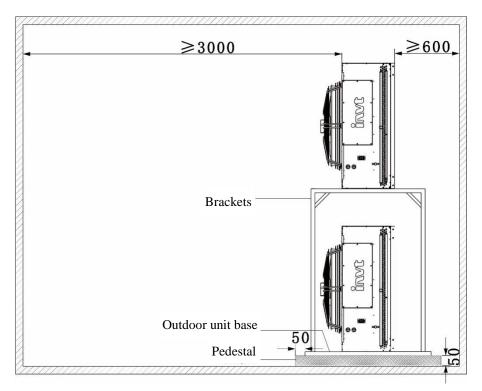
Two outdoor units stacked schematic (unit: mm)
